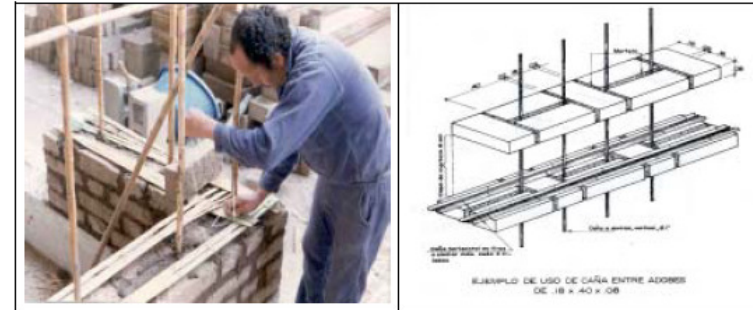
Construction of Cane Reinforcement In Peru (Blondet et al, 2002)
